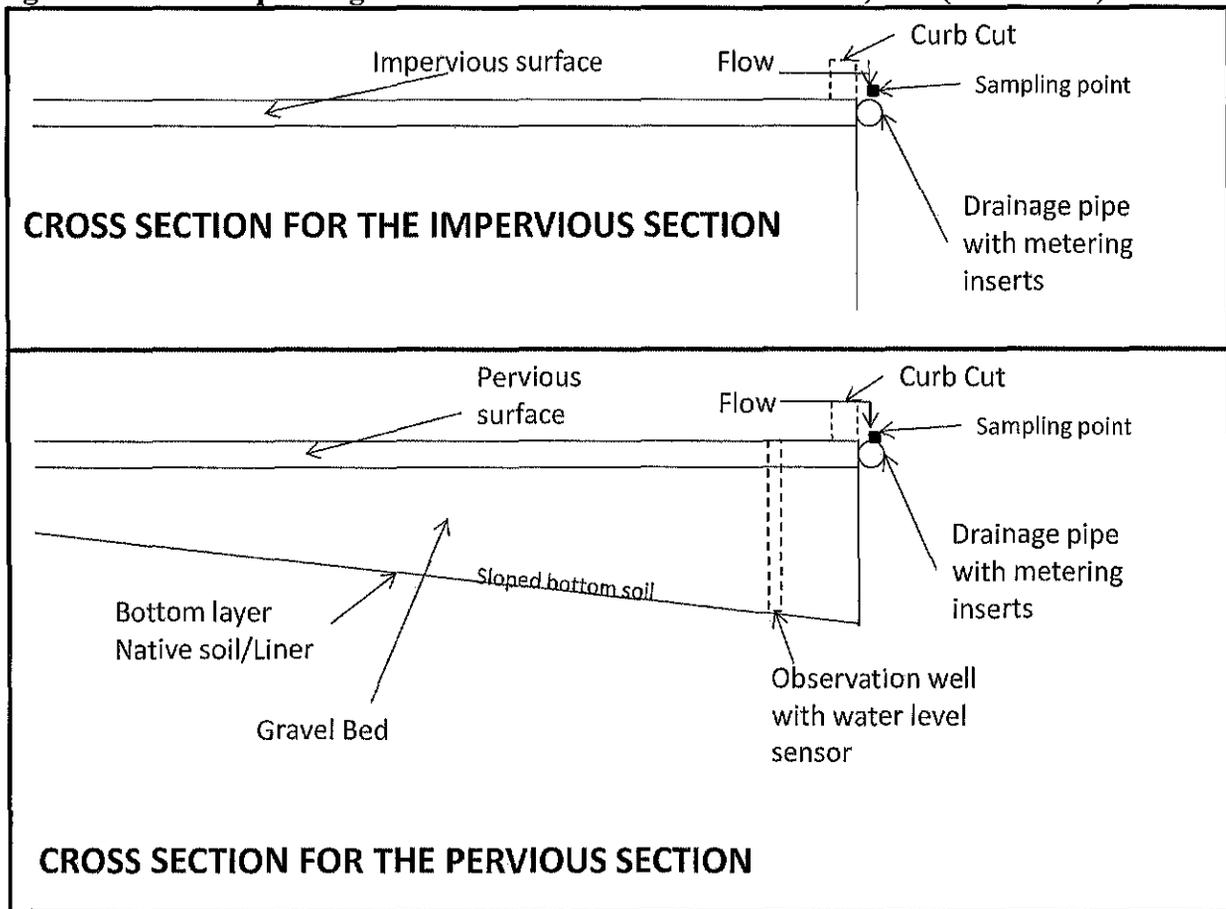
Pervious parking lot layout at Monte Bella Park, Brownsville, Tx. (schematics)
